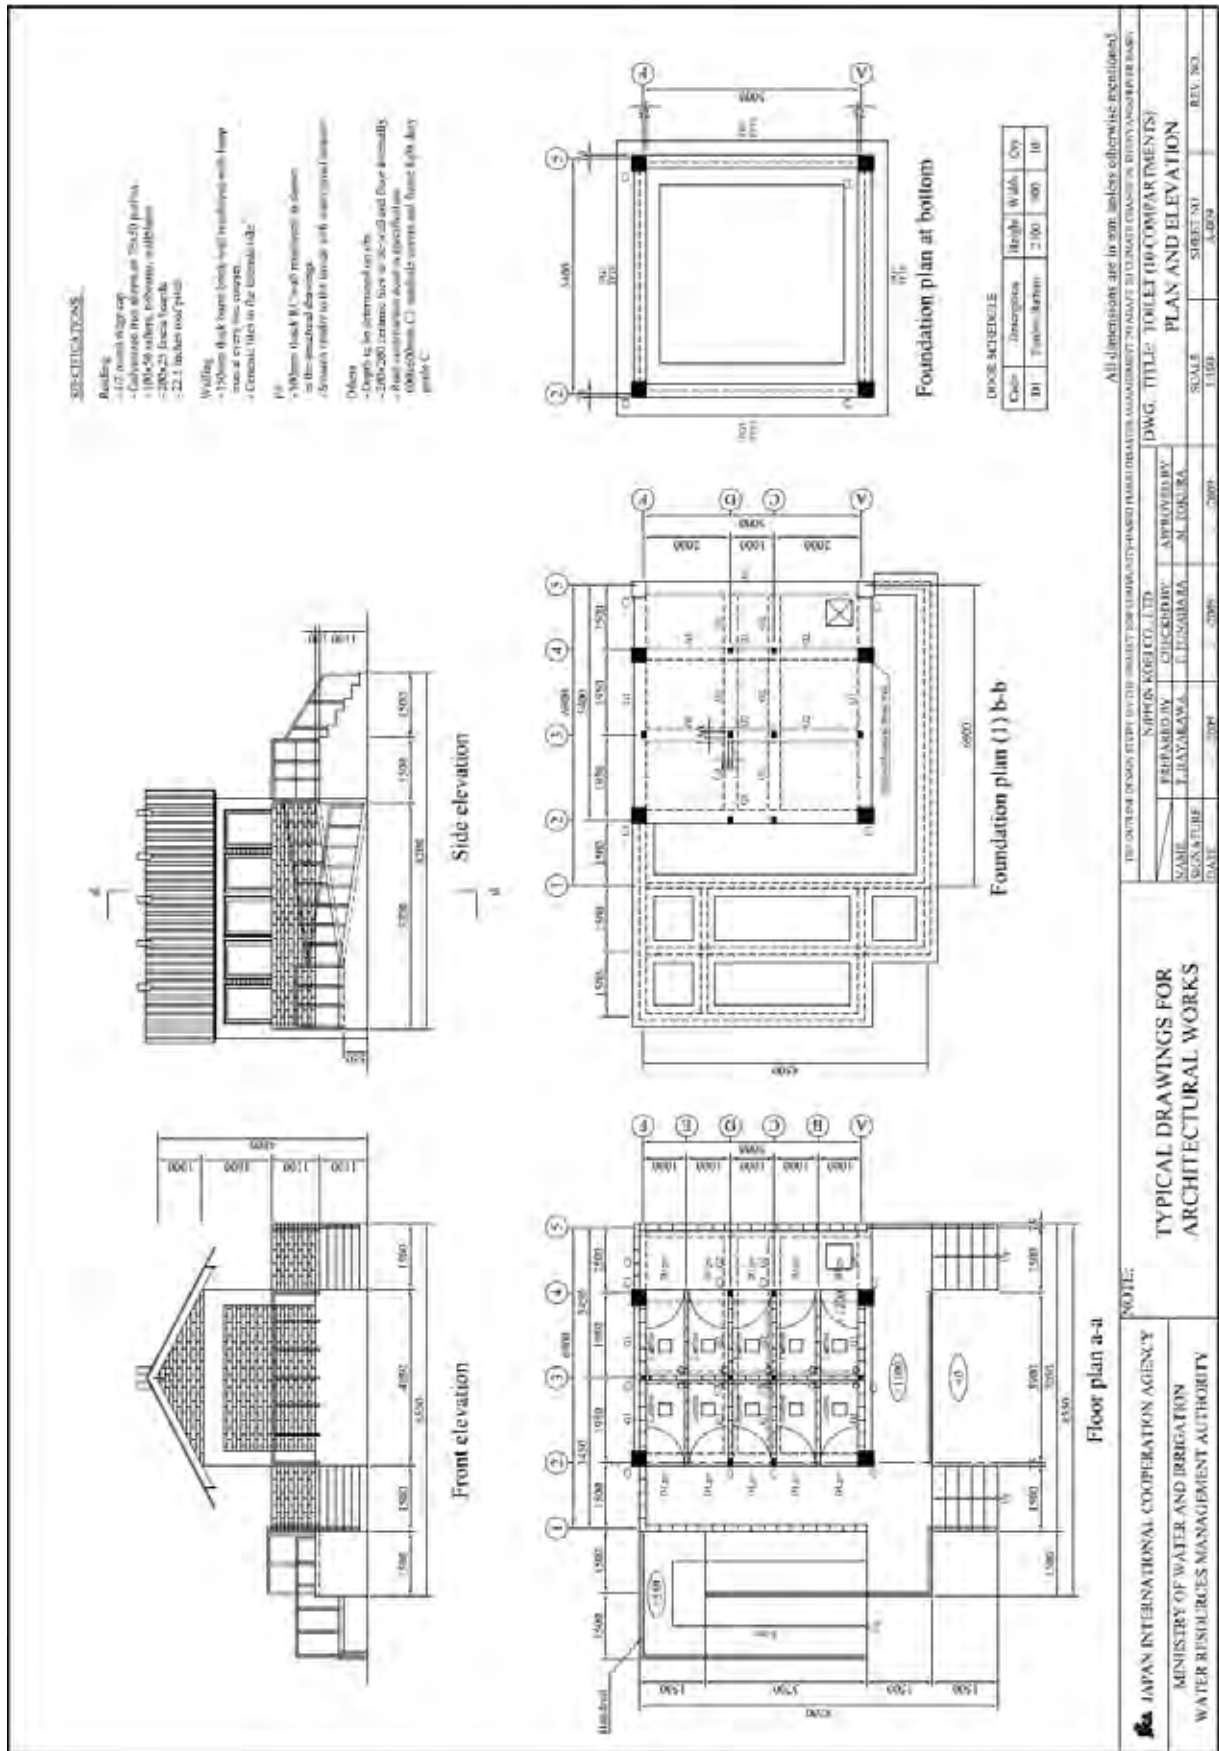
Toilet (10 compartments): Plan and Elevation
